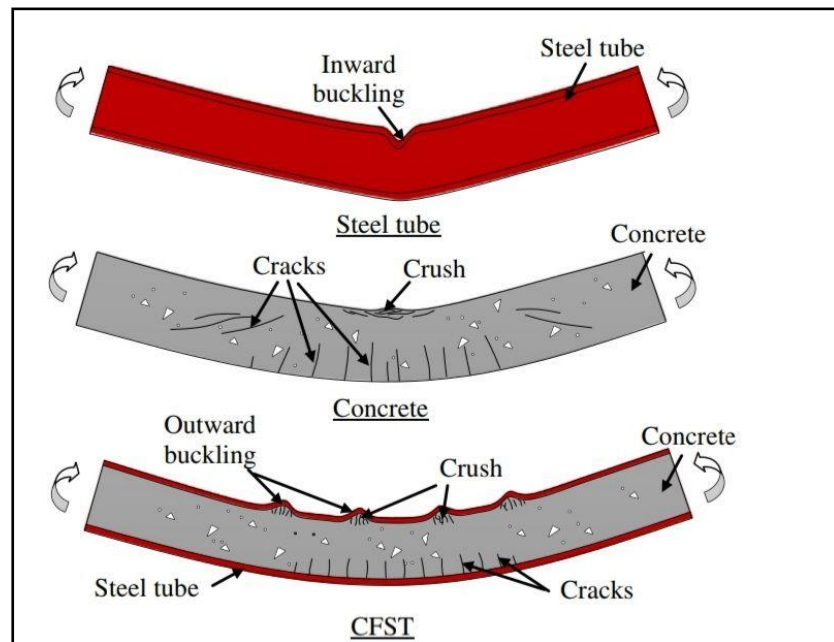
Failure Modes of CFST, Reinforced Concrete and Hollow Steel Members under Bending (Han et al., 2014).
